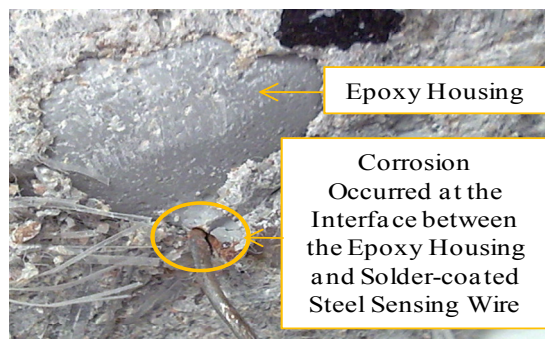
Corrosion at interface between solder-coated steel wire and epoxy coating (Sensor N019).
